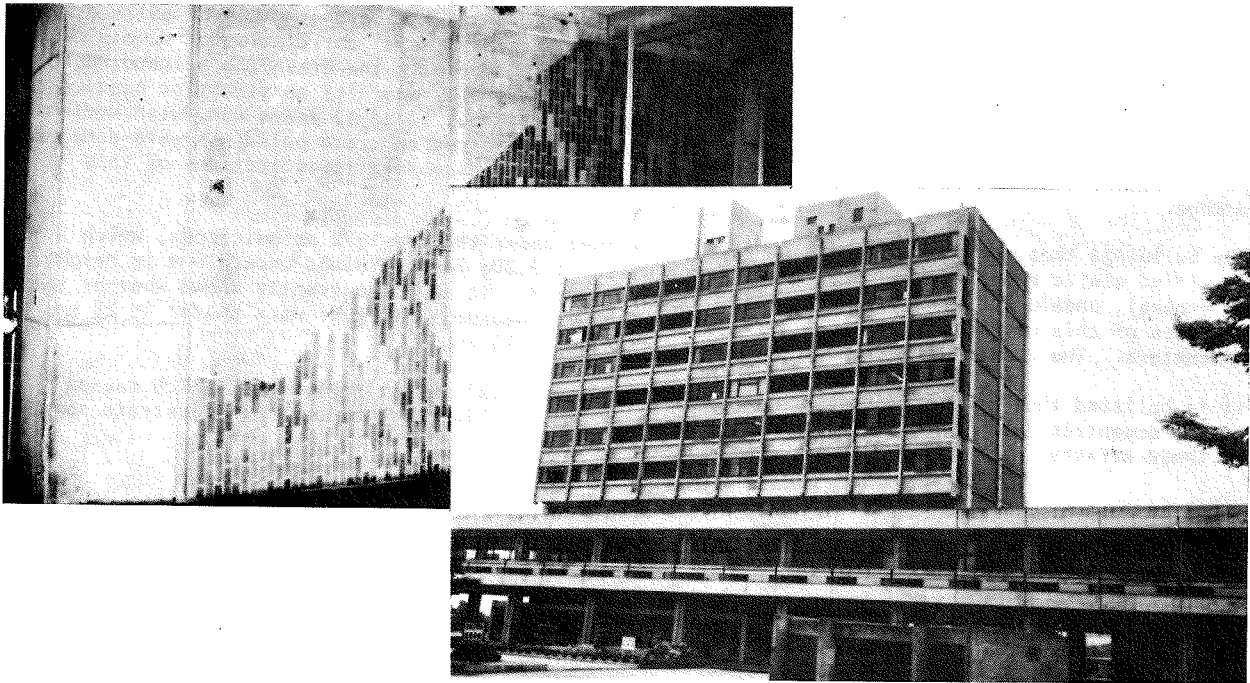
Faculty of Engineering building, Tohoku University: a general view (right) of the 9-story reinforced concrete frame building and a damaged transverse shear wall at the ground floor (left). Some of the glazed tile veneer has spalled along and above a diagonal crack.
